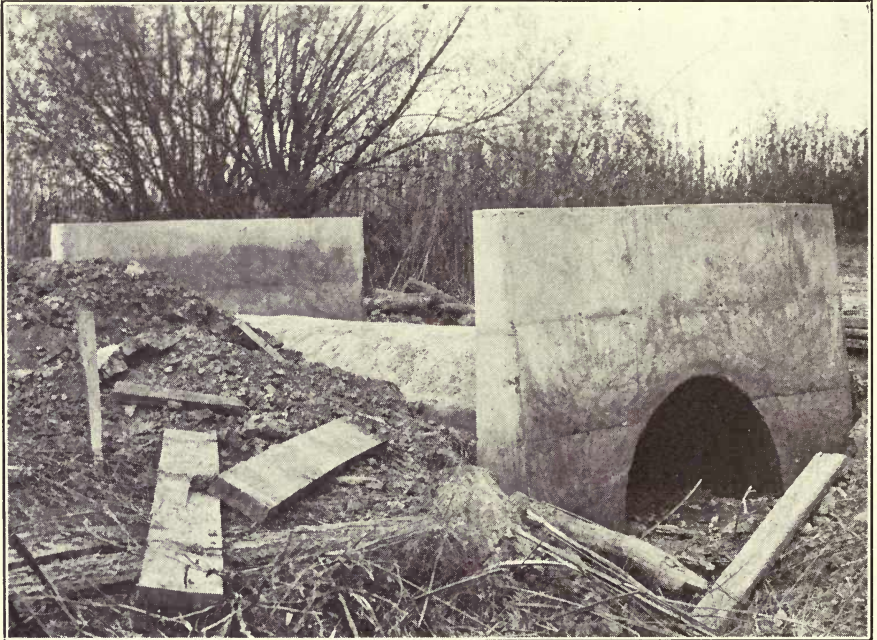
CONCRETE ARCH CULVERT IN BUREAU COUNTY, ILLINOIS.
